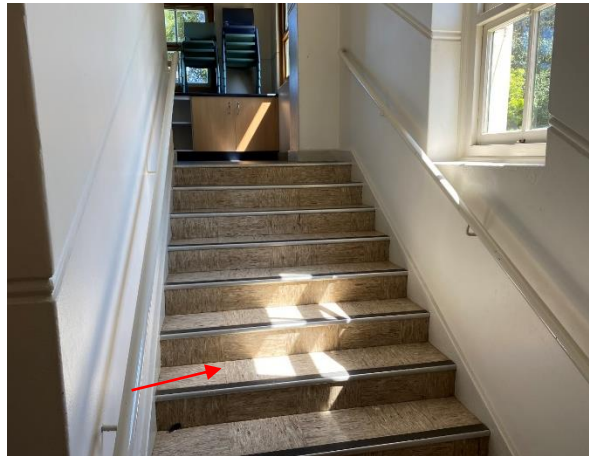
Building A - Asbestos containing 12" vinyl floor tiles to stairs and movement areas throughout
